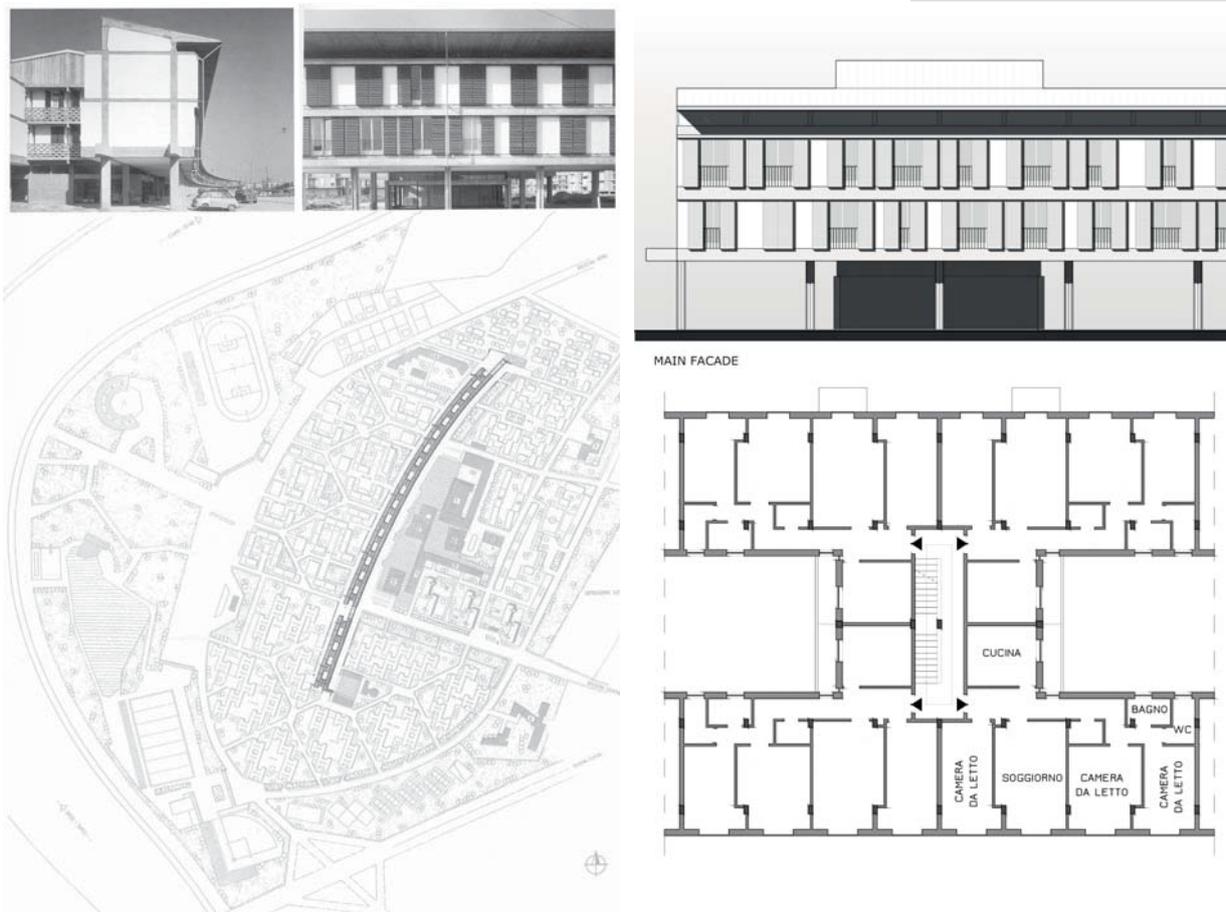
Historical photos, main façade and first floor plan of the Treno in Barca district.
